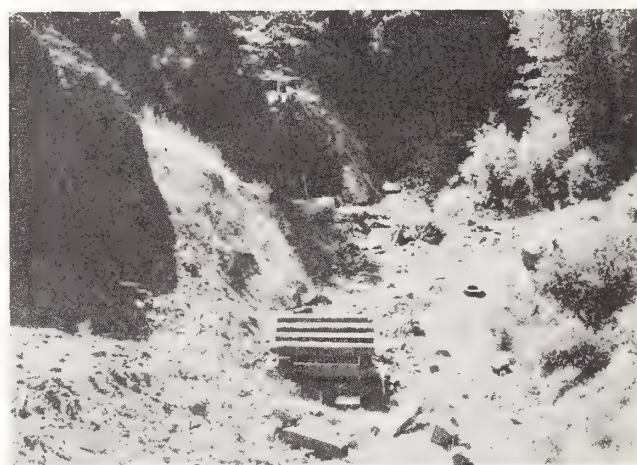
Timber debris crib in ideal location, i.e., high roadway embankment and large settling basin.
